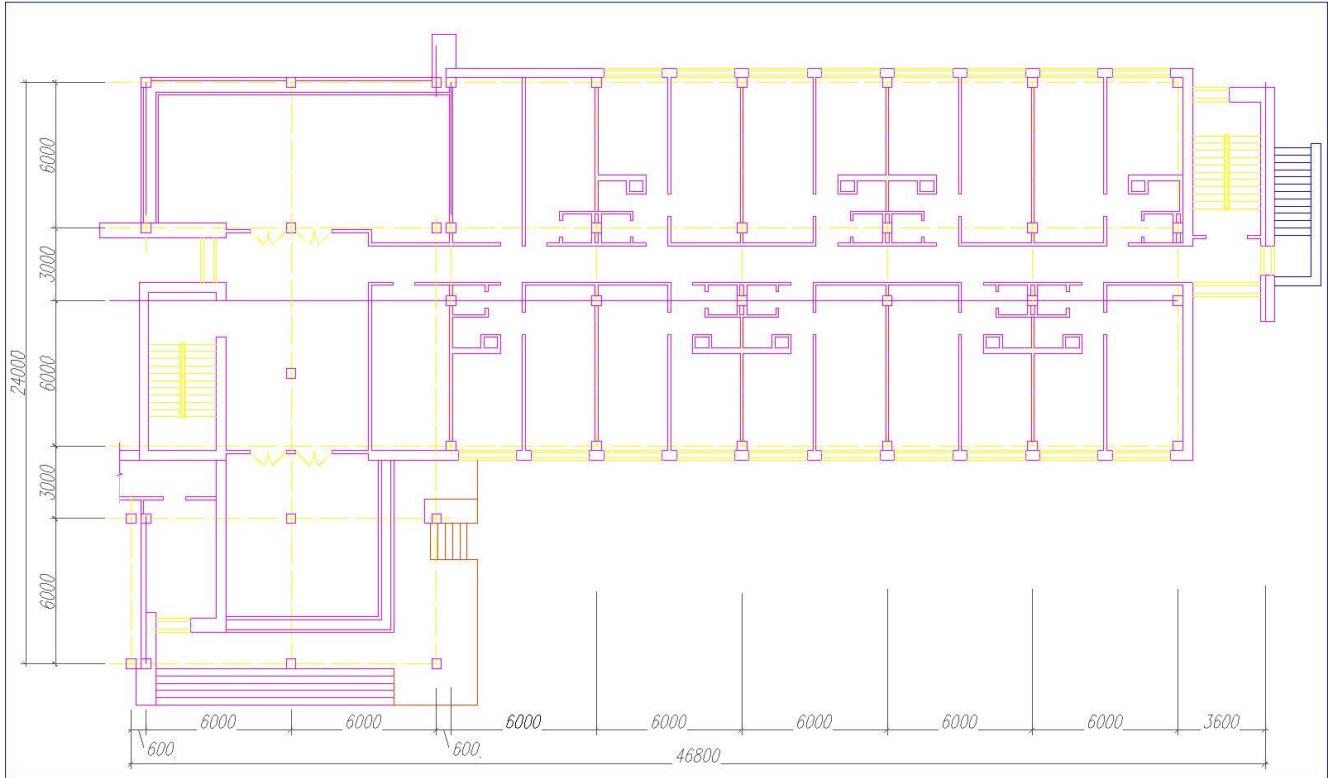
DORMITORY BUILDING, 2-4 FLOOR LAYOUT
